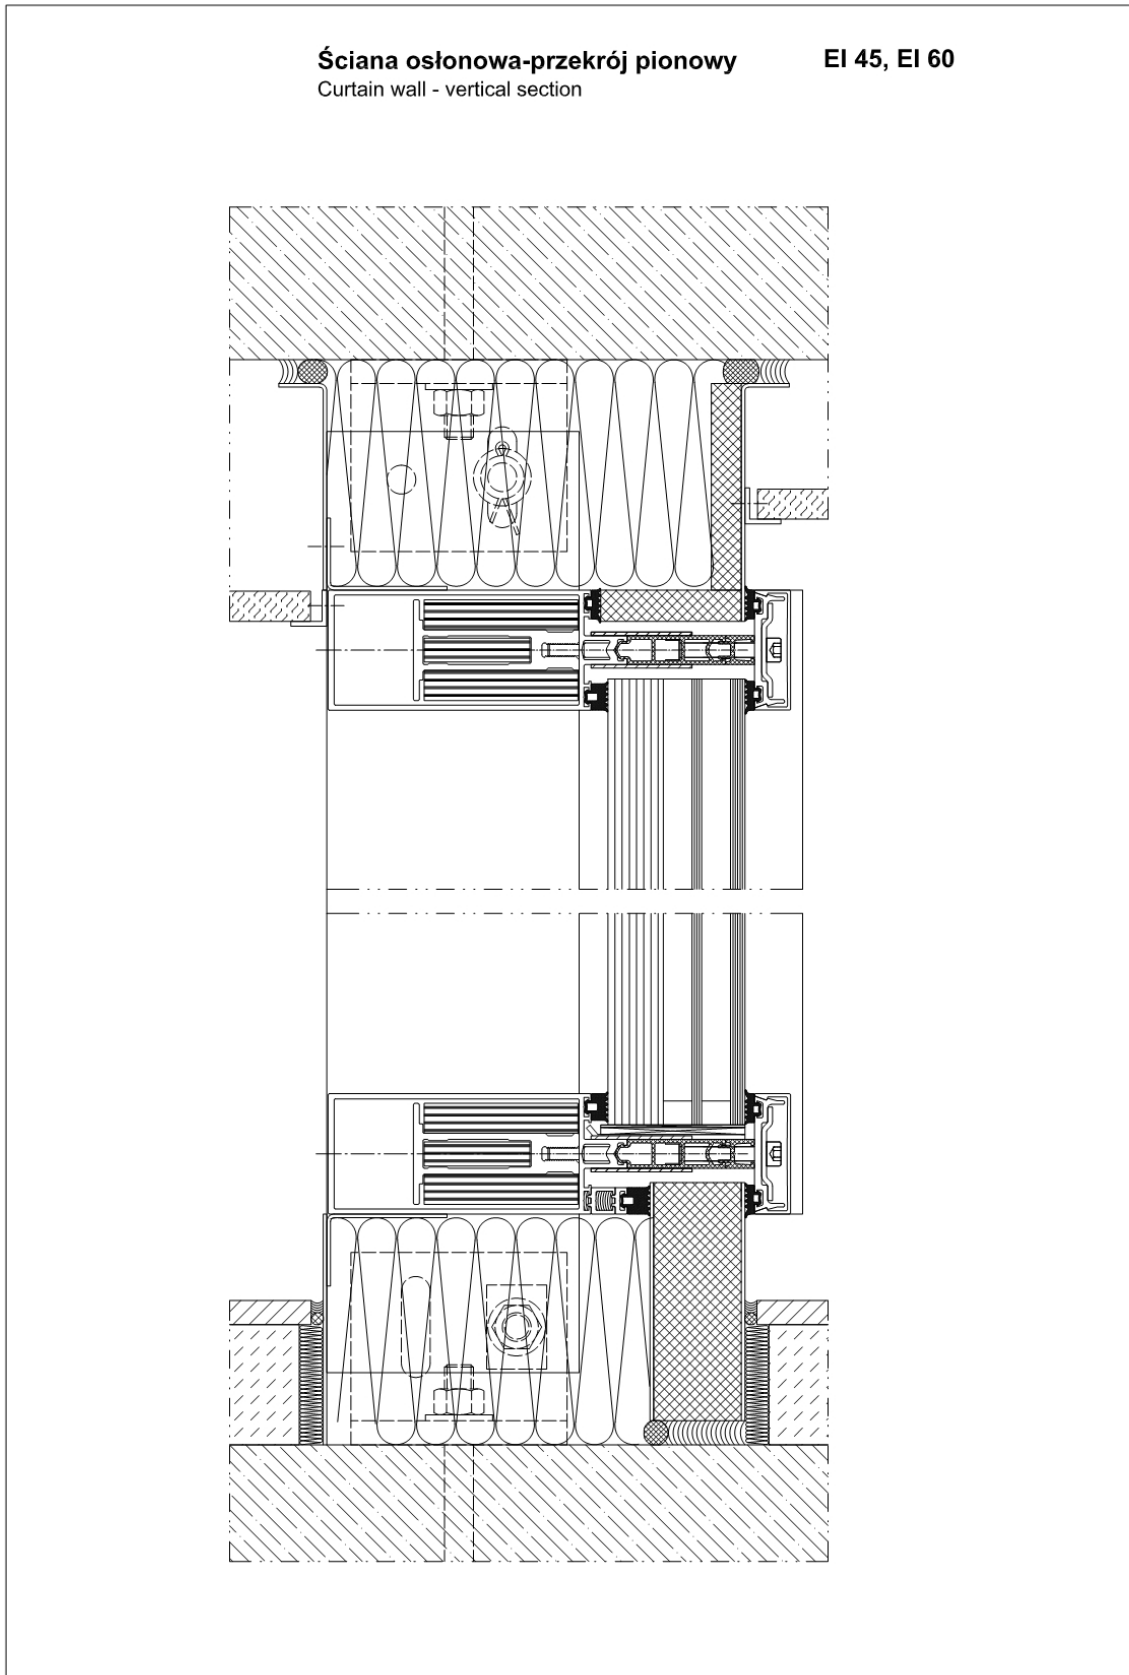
MB-SR50N EI EI60 system between floors curtain wall - vertical cross section
